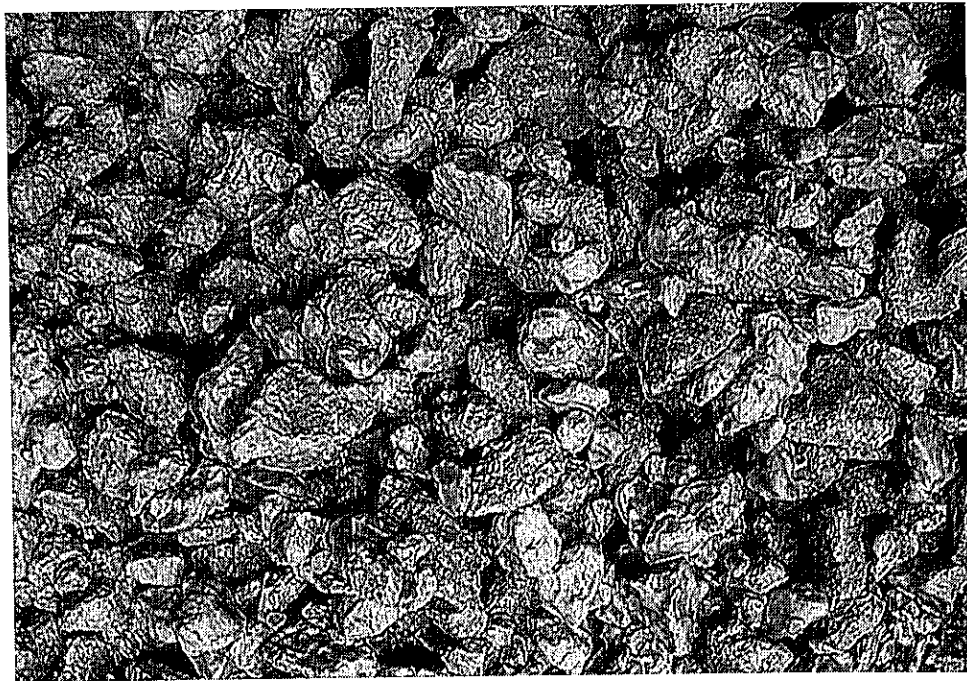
Bloomington drainage layer mix after a 75 second mix time.
